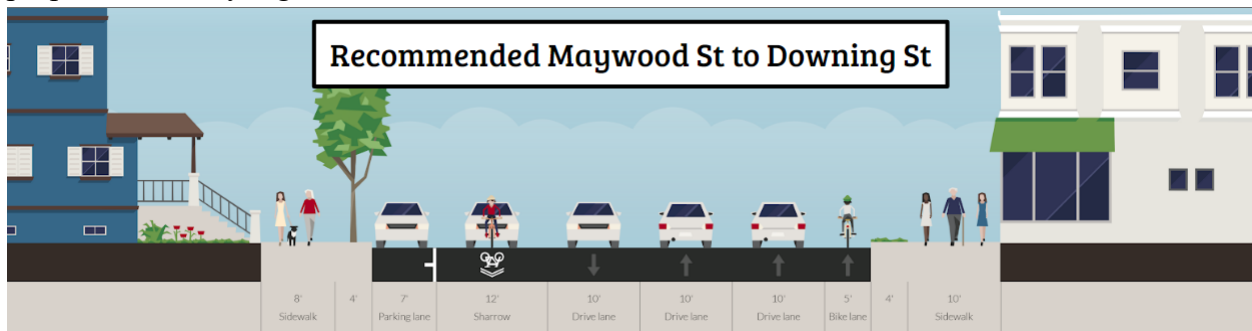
Proposed Maywood Street to Downing Street Cross Section looking north
